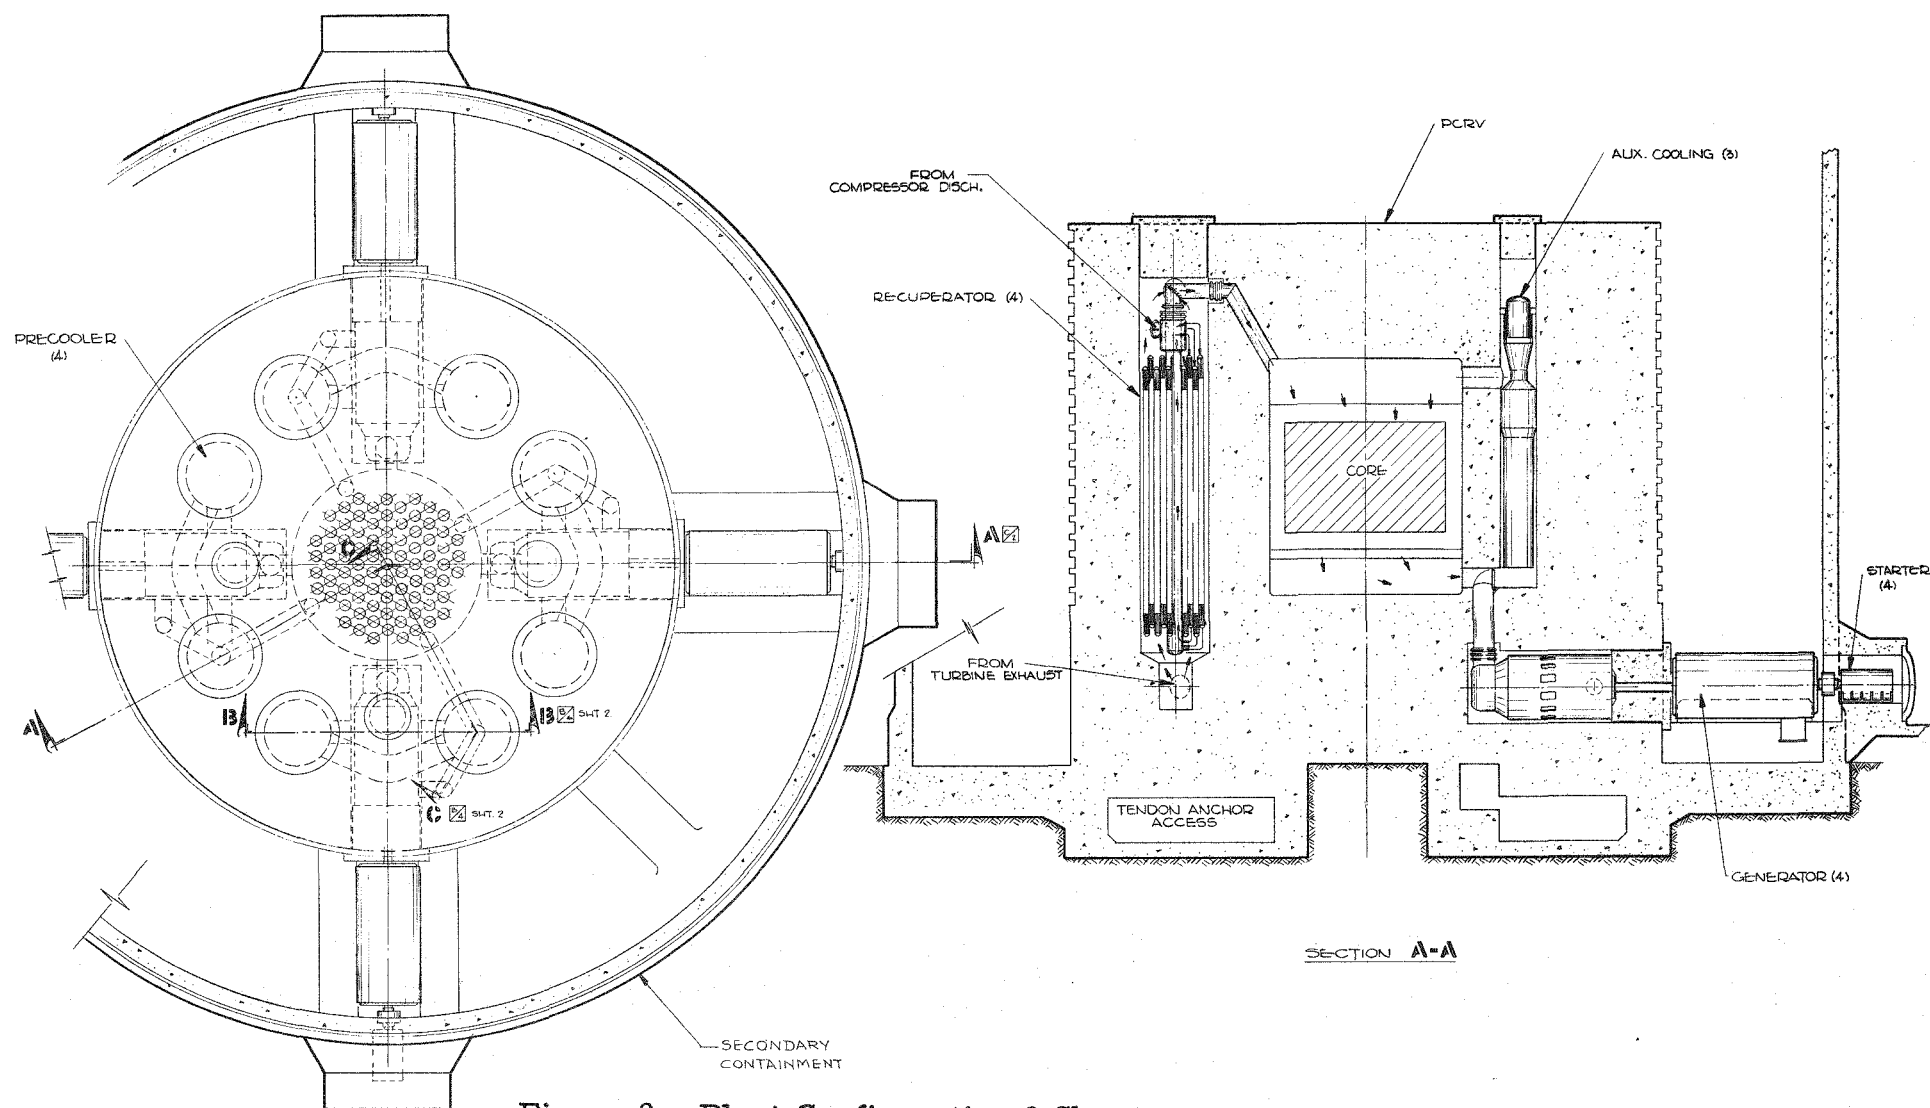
Plant Configuration 3 Showing Single-Shaft Turbomachinery and Horizontal Generator.
